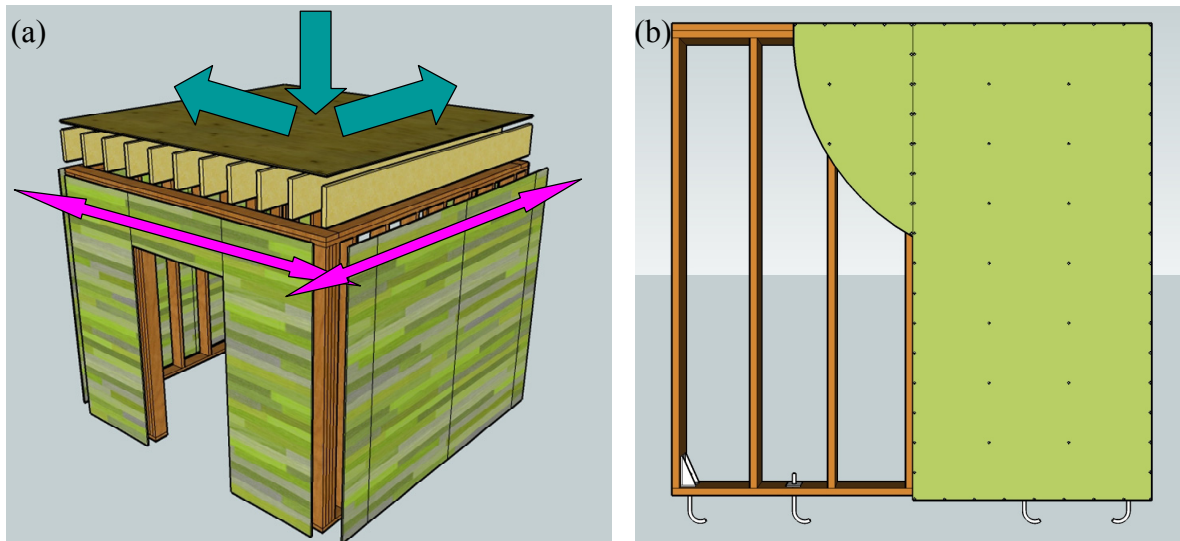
Illustration of (a) a single-story light-frame wood structure, and (b) a wood shear wall
